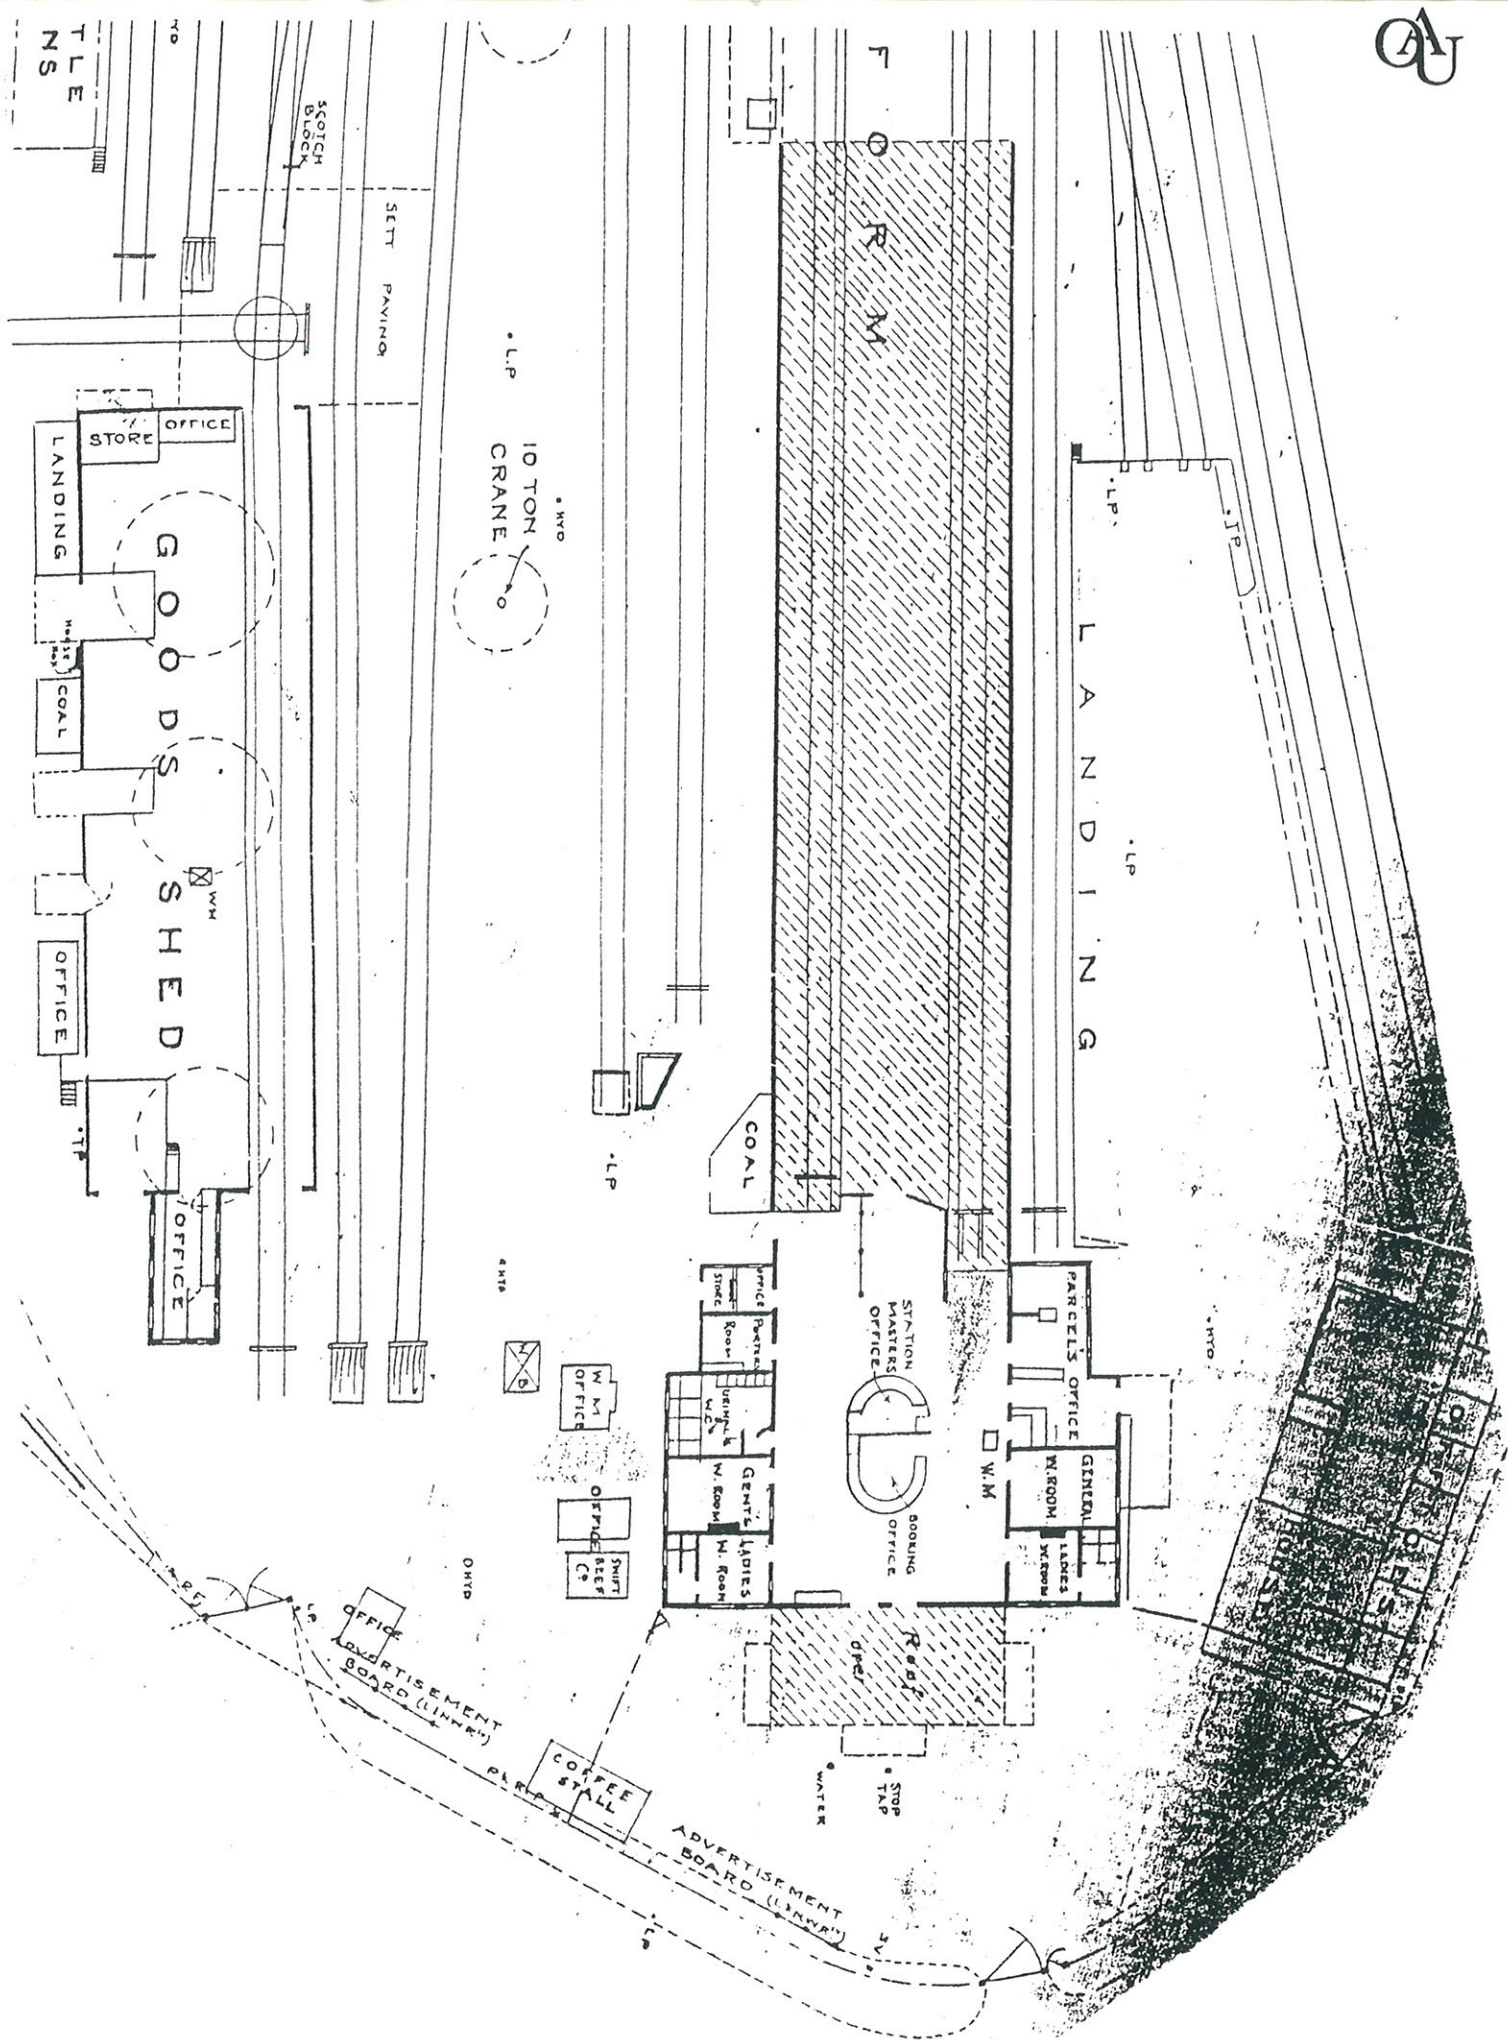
Plan of station yard in early 20th cent. (Railtrack)
